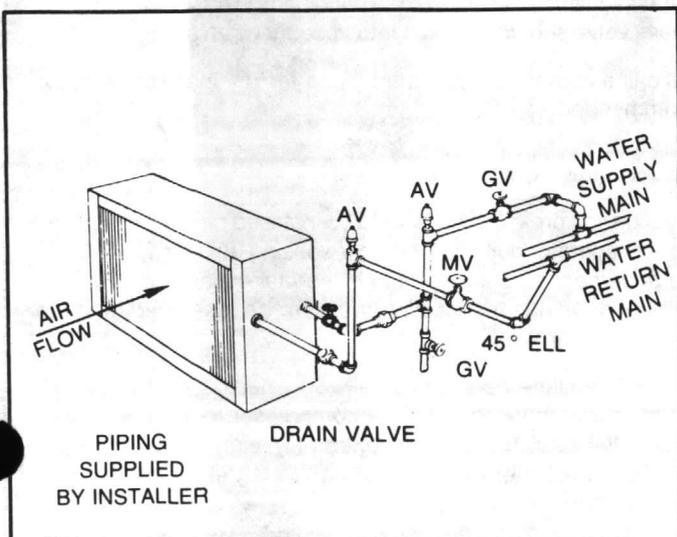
Typical Piping for Type W, Two-Row Water Coil
